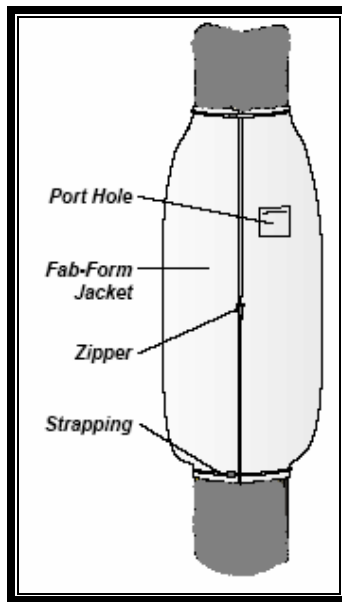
Fab-Form Concrete Pile Jacketing (reproduced from Denso North America Inc).
